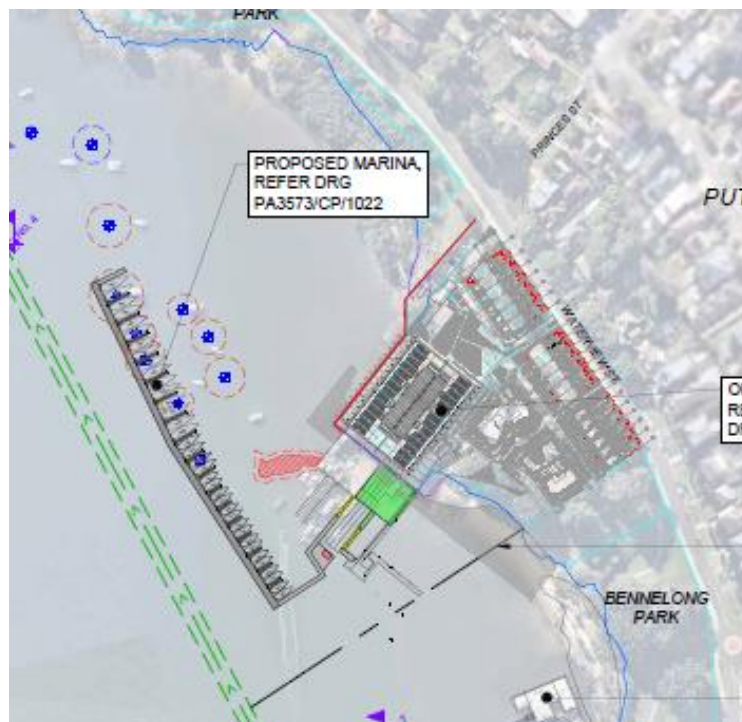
Proposed site plan (note: consent is sought only for non land-based works as part of the subject application)
